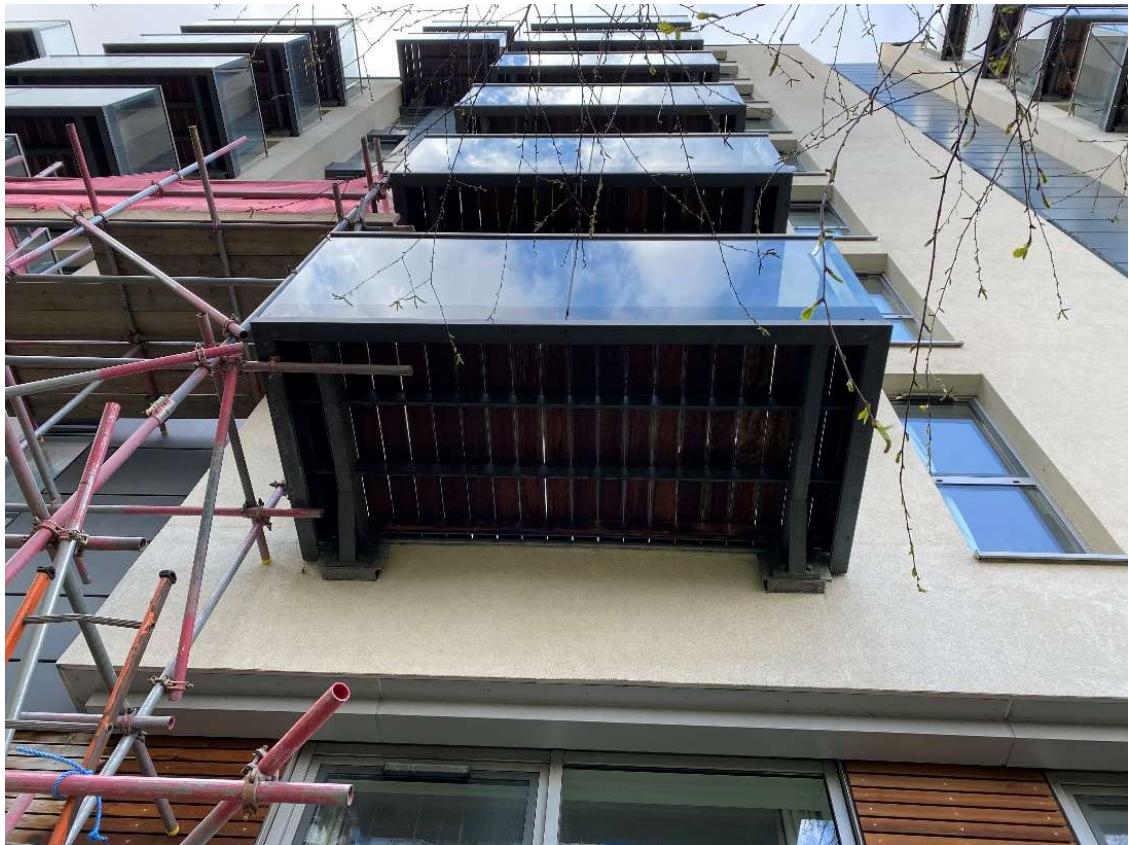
Photo of the underside of the projecting balconies, and the aluminium replacement decking installed (typical East Elevation of projecting balconies)
